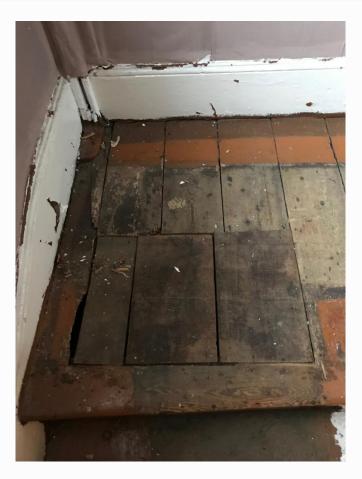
Patched and damaged floorboards at 1st floor landing level.
